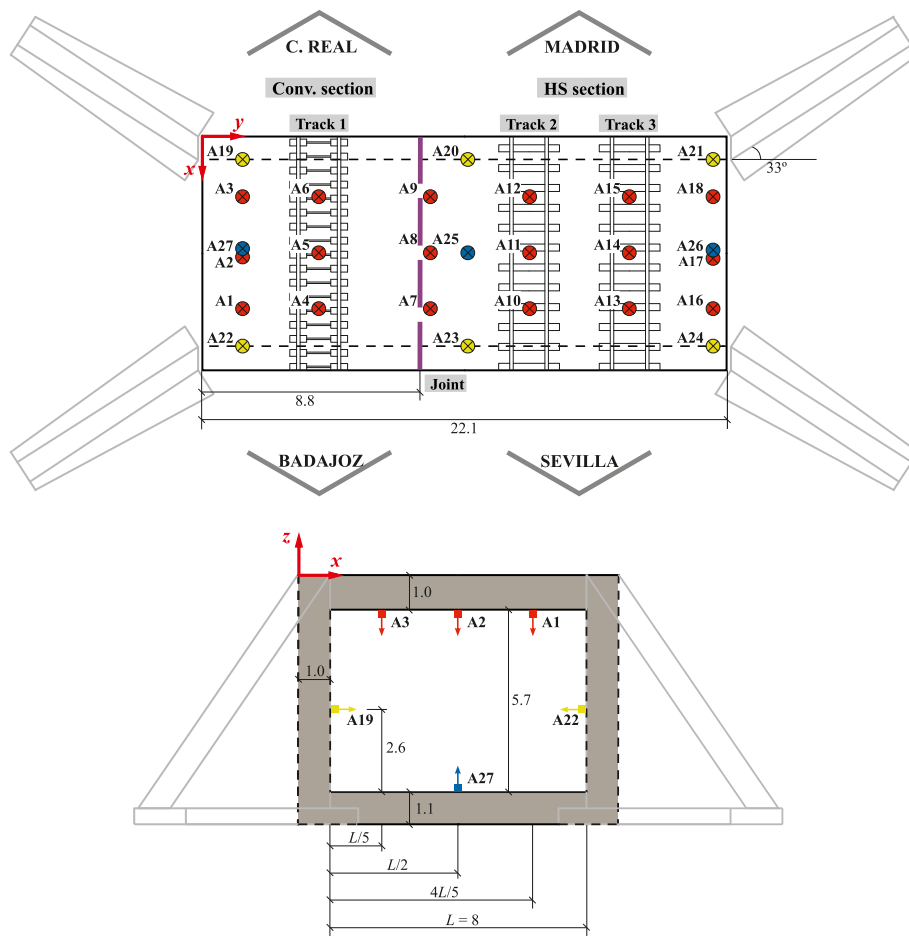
Accelerometer layout and dimensions of the portal frame.
